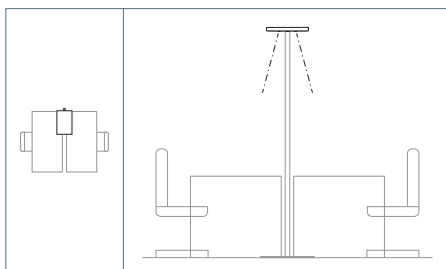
Aligning sensors for workplace occupancy: 2 workplaces.
